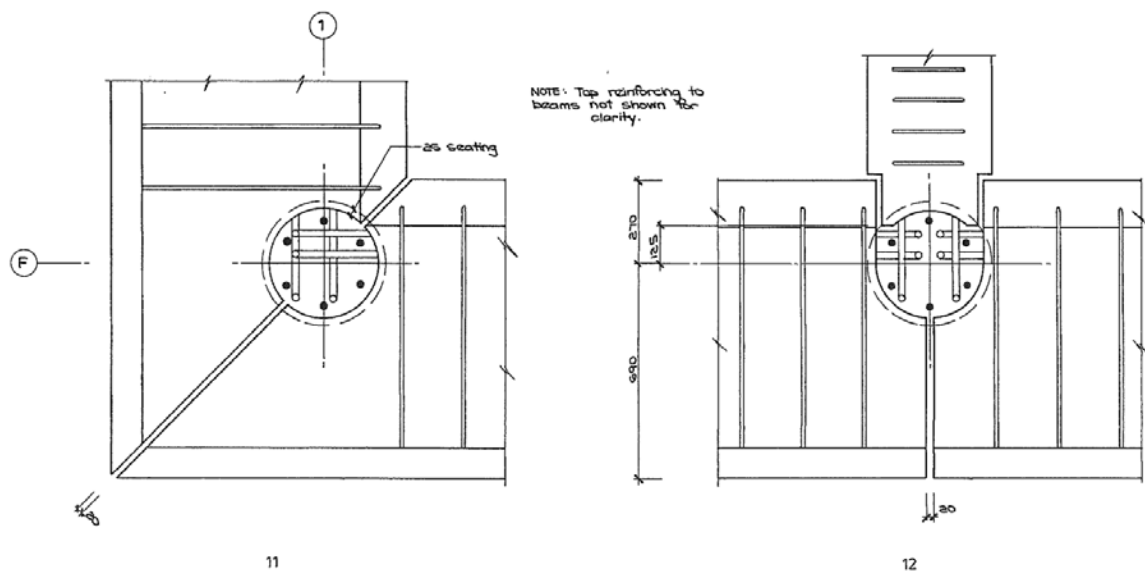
Plan views of CTV Building exterior joints (Design Engineer 1986a)
